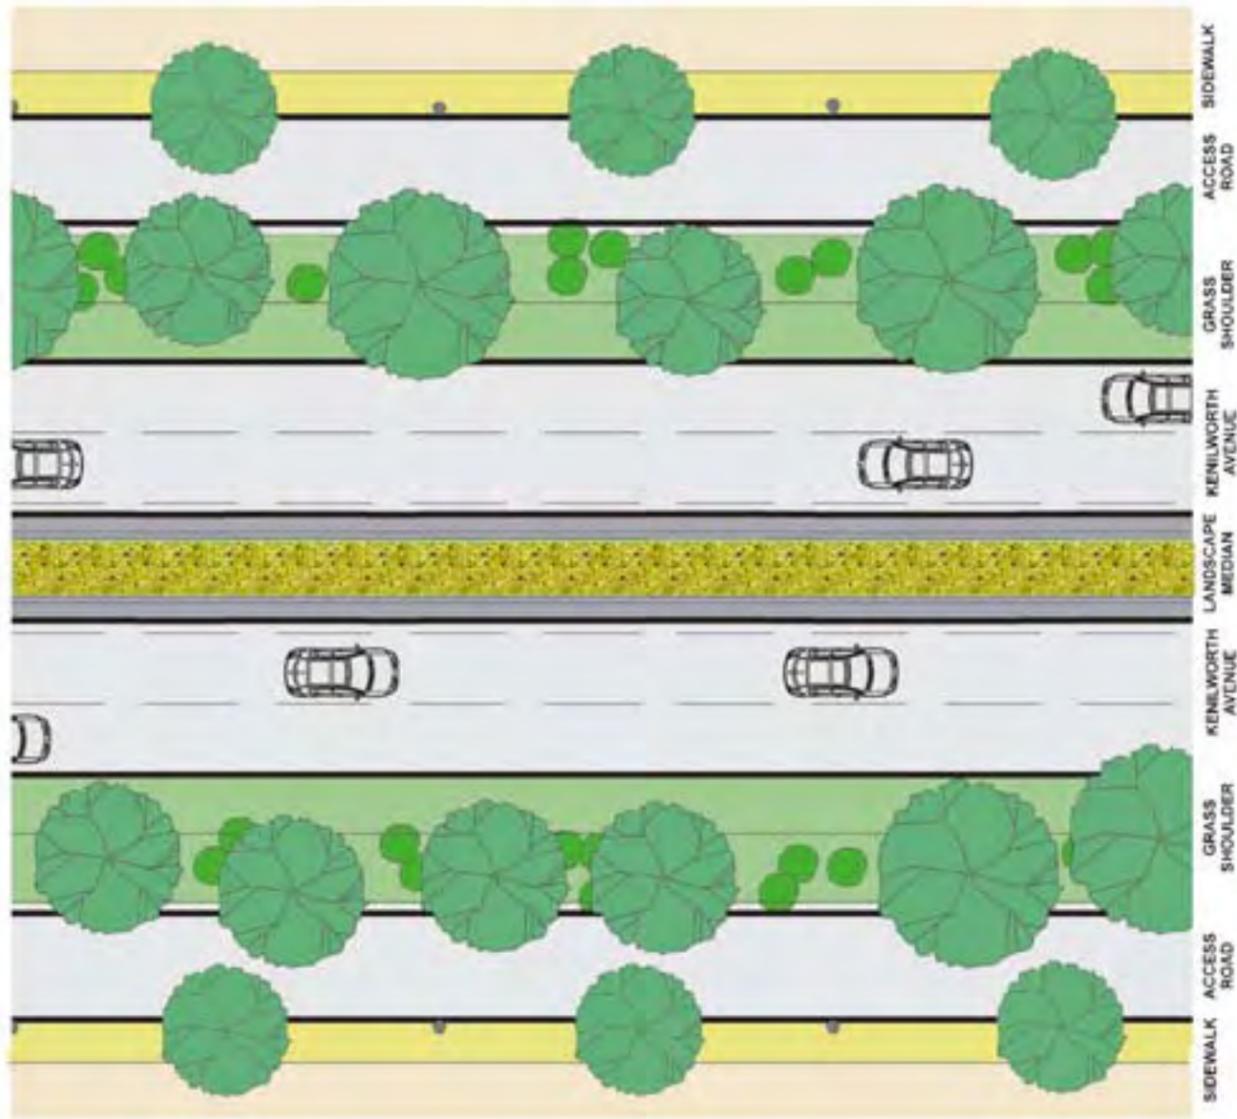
Typical Plan for a four-lane roadway (landscaped medians and reinforced green shoulders)
